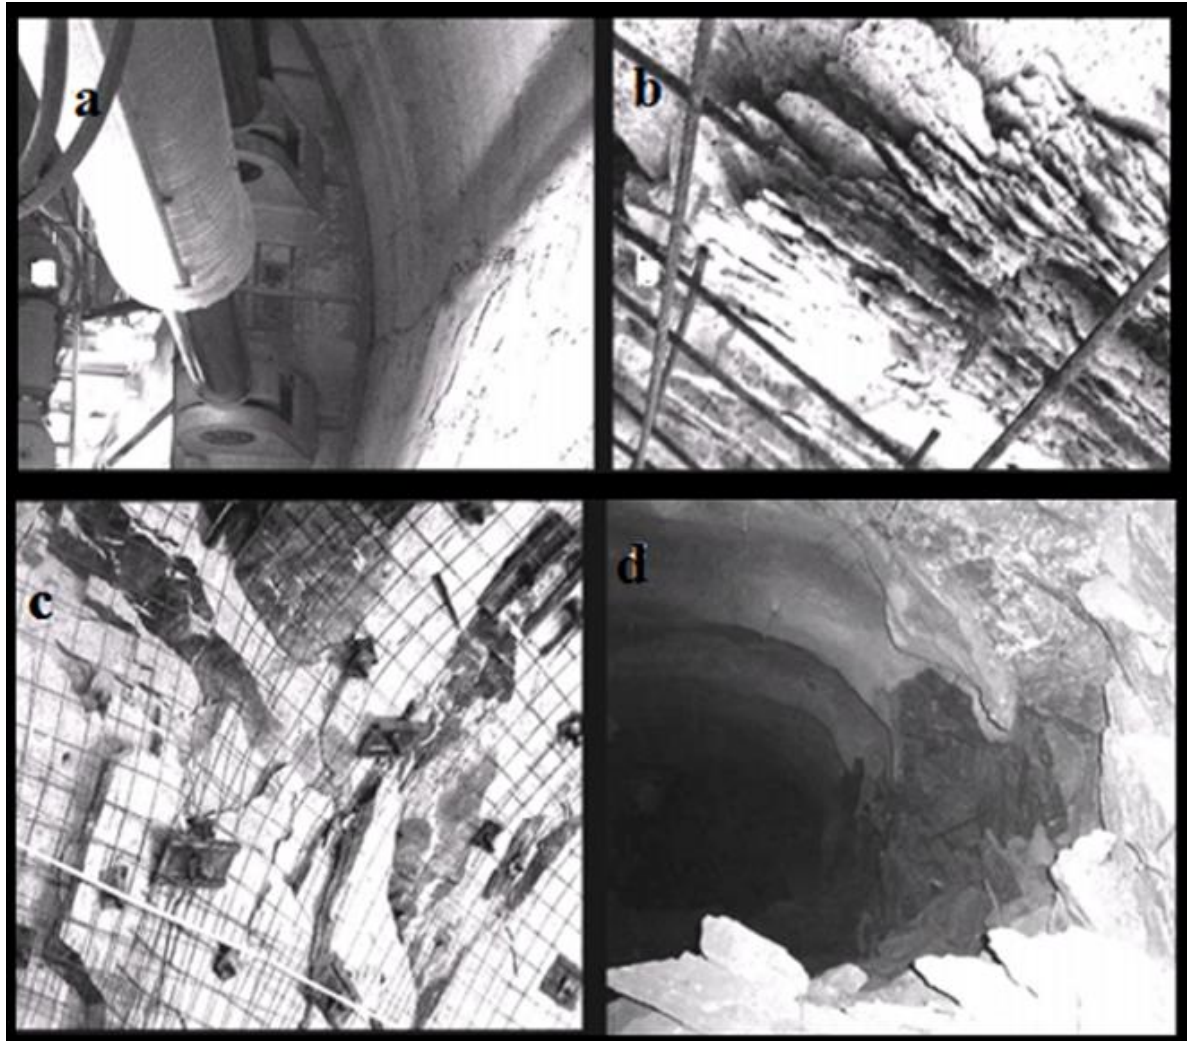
Increasing levels of brittle spalling and operational challenges: a) spalling initiation (small scales on the wall); b) spalling pieces of grain thickness penetrating into wall; c) parallel wall slabs; d) strain bursting of spall damaged ground due to high stresses (Loew et al, 2010).
